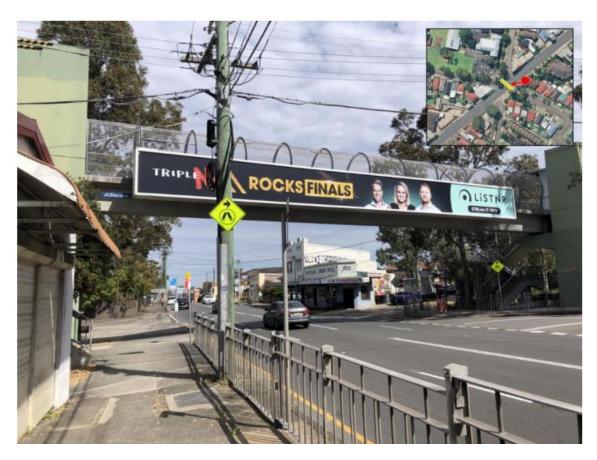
| Existing sign as seen from Canterbury Road looking southwest (Source: SEE, 2024)
